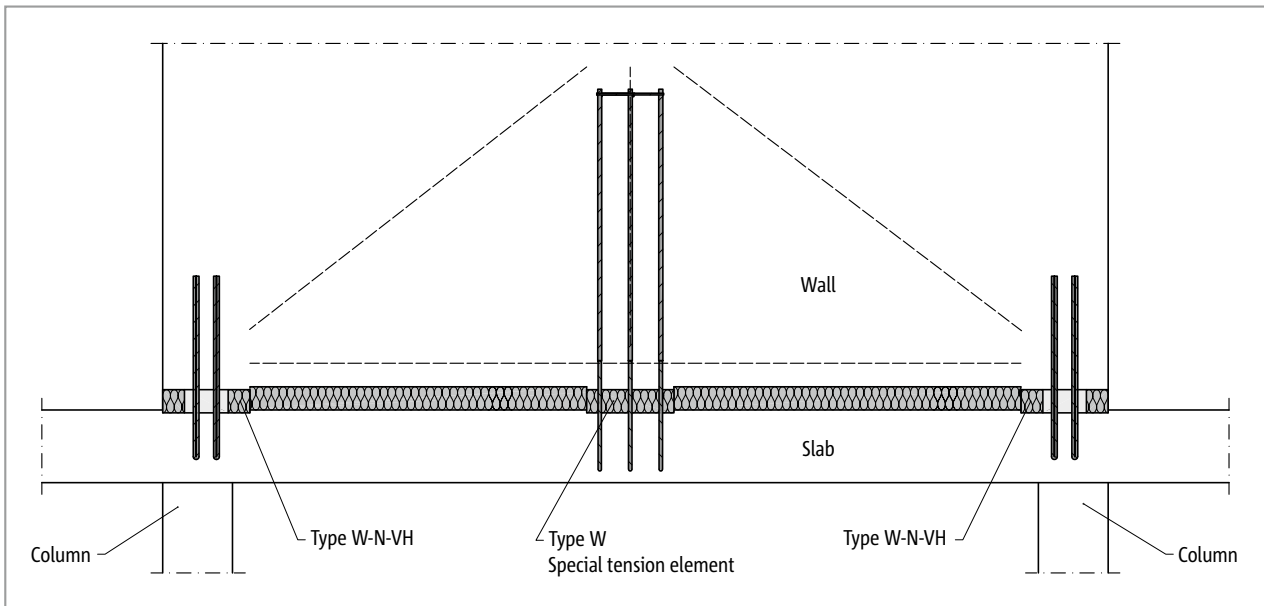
Schöck Sconnex® type W: Combined product variants for the connection of a wall type beam with ceiling suspension
